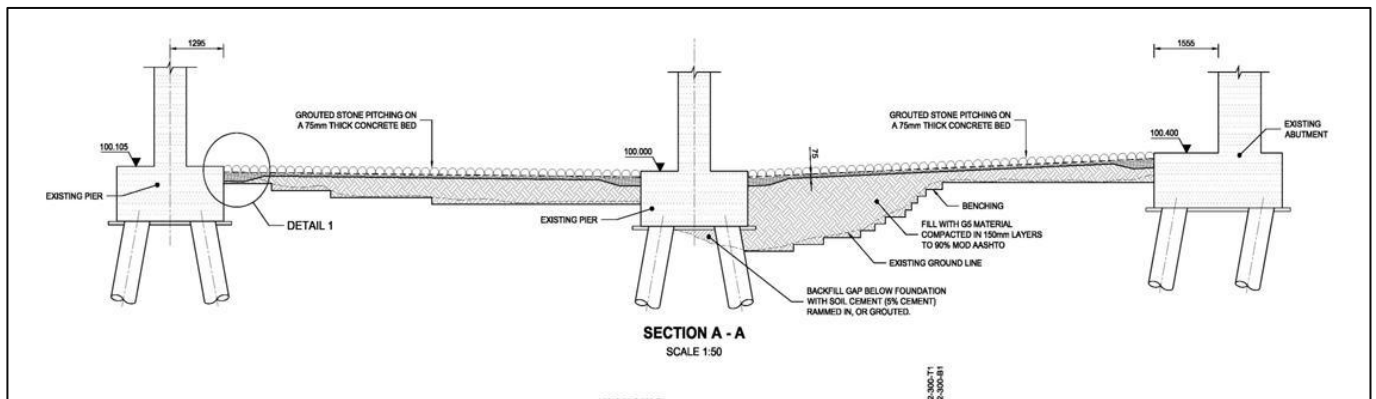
Cross sectional plan of the proposed erosion protection to be installed at Keisies River Bridge 5581
